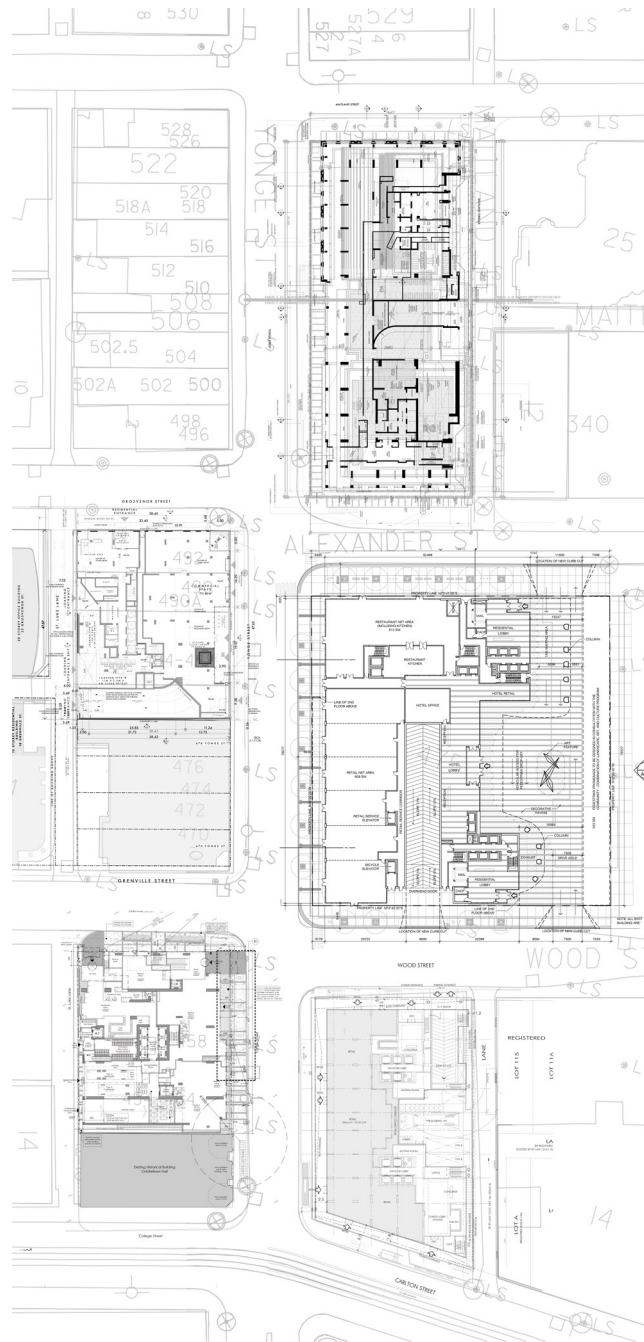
Yonge and College: Site Plan Applications for the five developments were combined to better understand what the ground plane looks like when developments are built on a 20 meter right-of-way.
